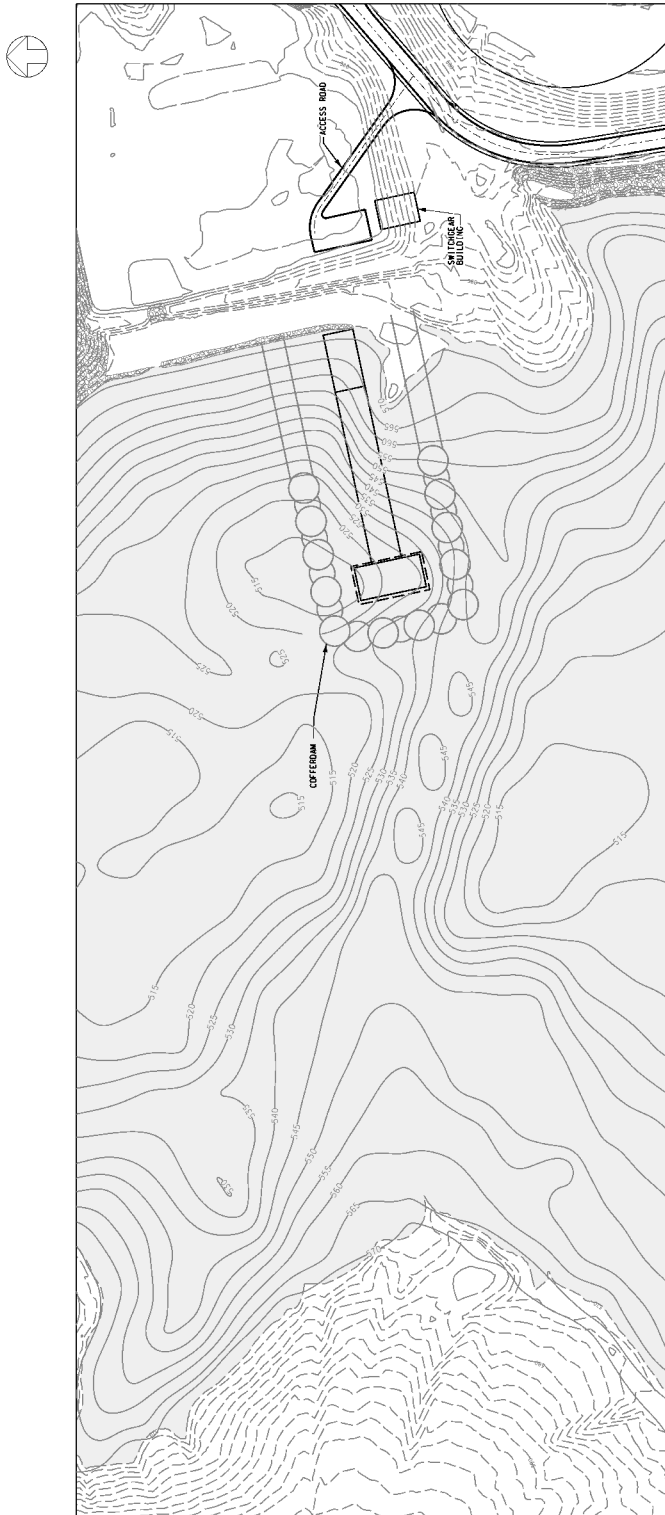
Planned Configuration of the Make-Up Pond B Intake Structure and Access Pier (Duke 2012h)
